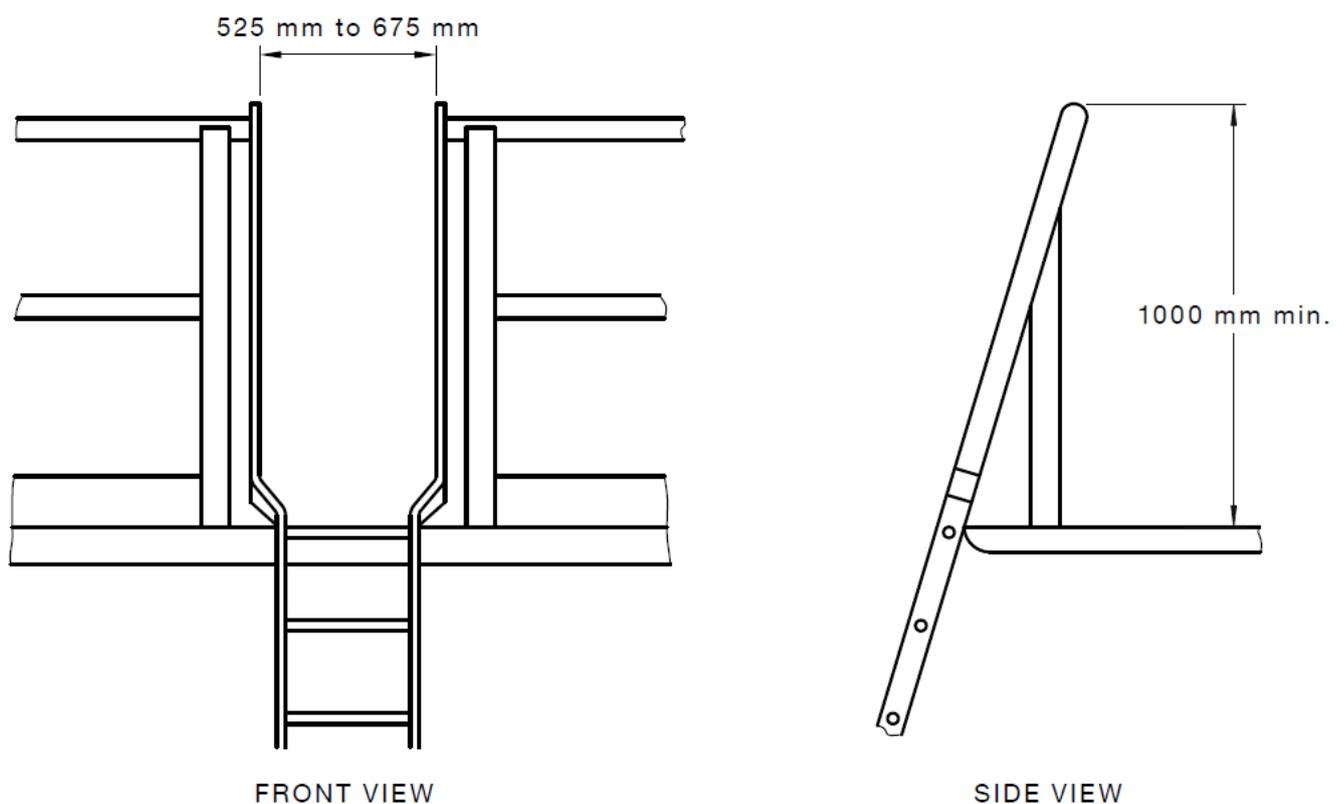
TYPICAL STILES FOR STEP-THROUGH LADDERS
